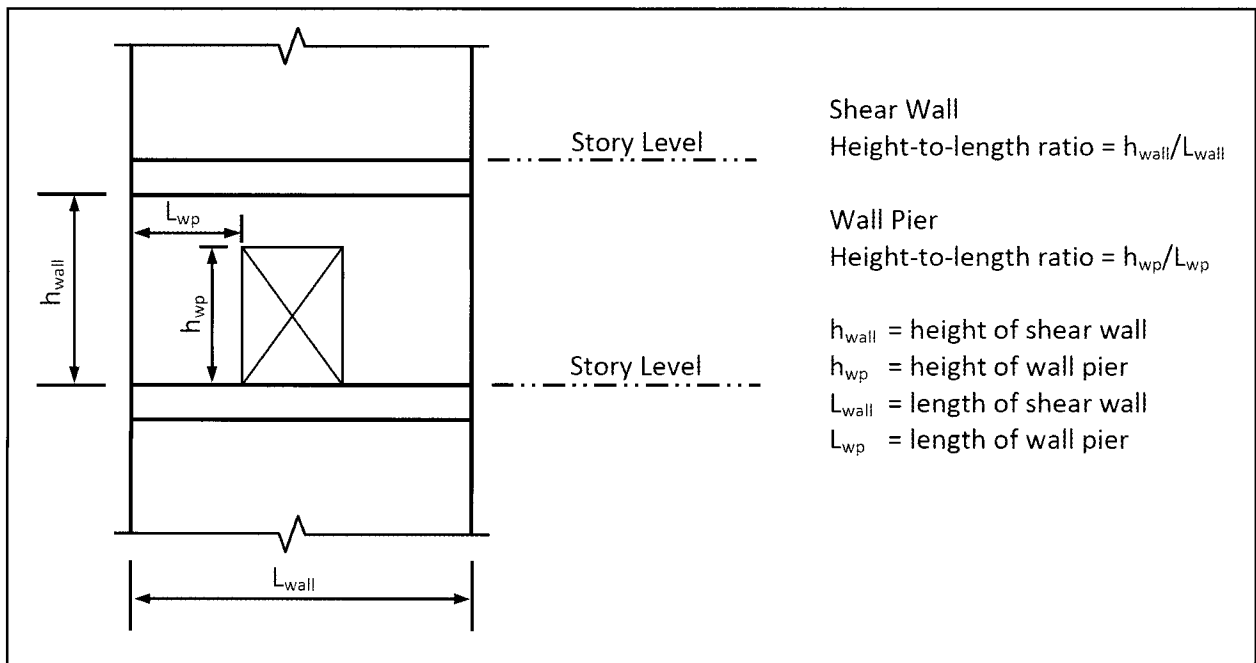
Shear Wall and Wall Pier Height-to-Length Ratio Determination
